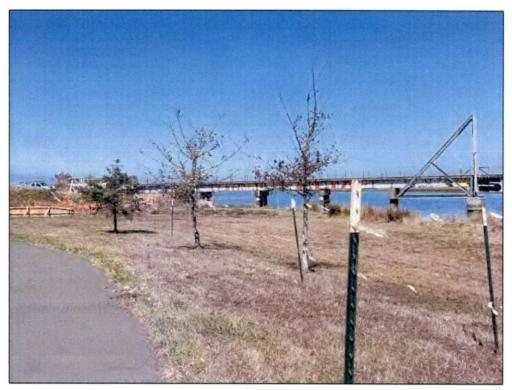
A (VAU 1, KOP 1). Existing view of the proposed trail alignment and NCRA Railroad bridge crossing over Eureka Slough. View looking north towards Humboldt Bay.
